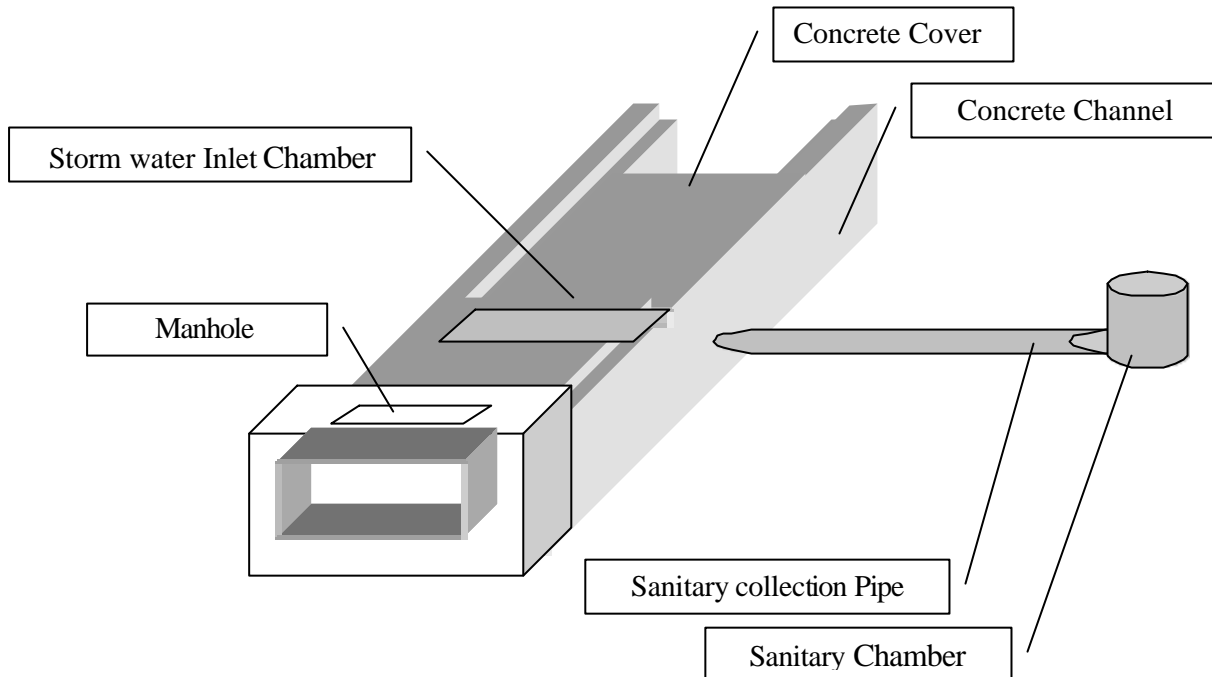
SCHEMATIC OF SEWAGE COLLECTION FACILITIES
